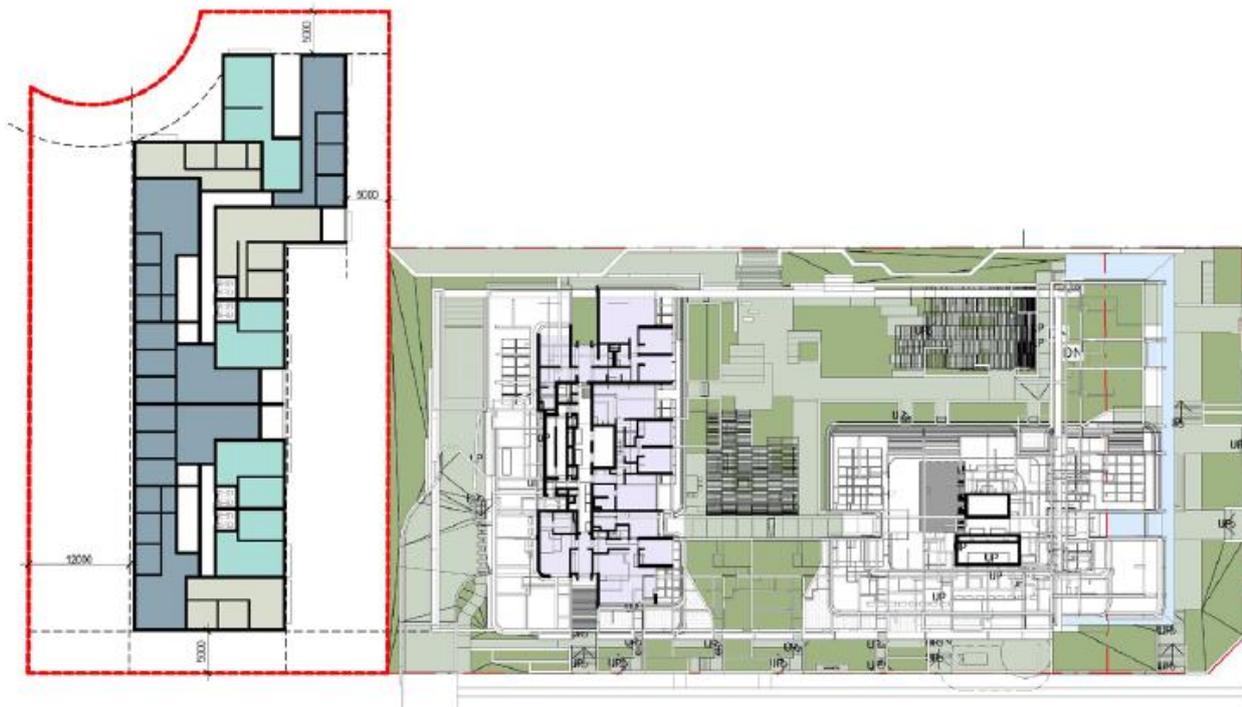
Indicative future development potential at 13 Cottonwood Crescent and 12-14 Lachlan Avenue (outlined in red as a consolidated site).
